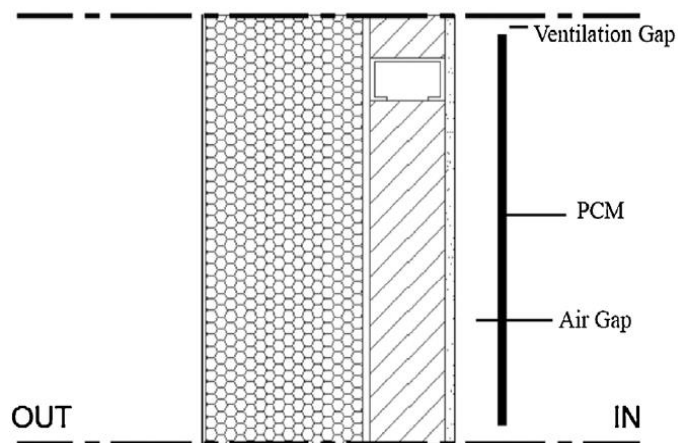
PCM installation in the wall with ventilation gap [95]
